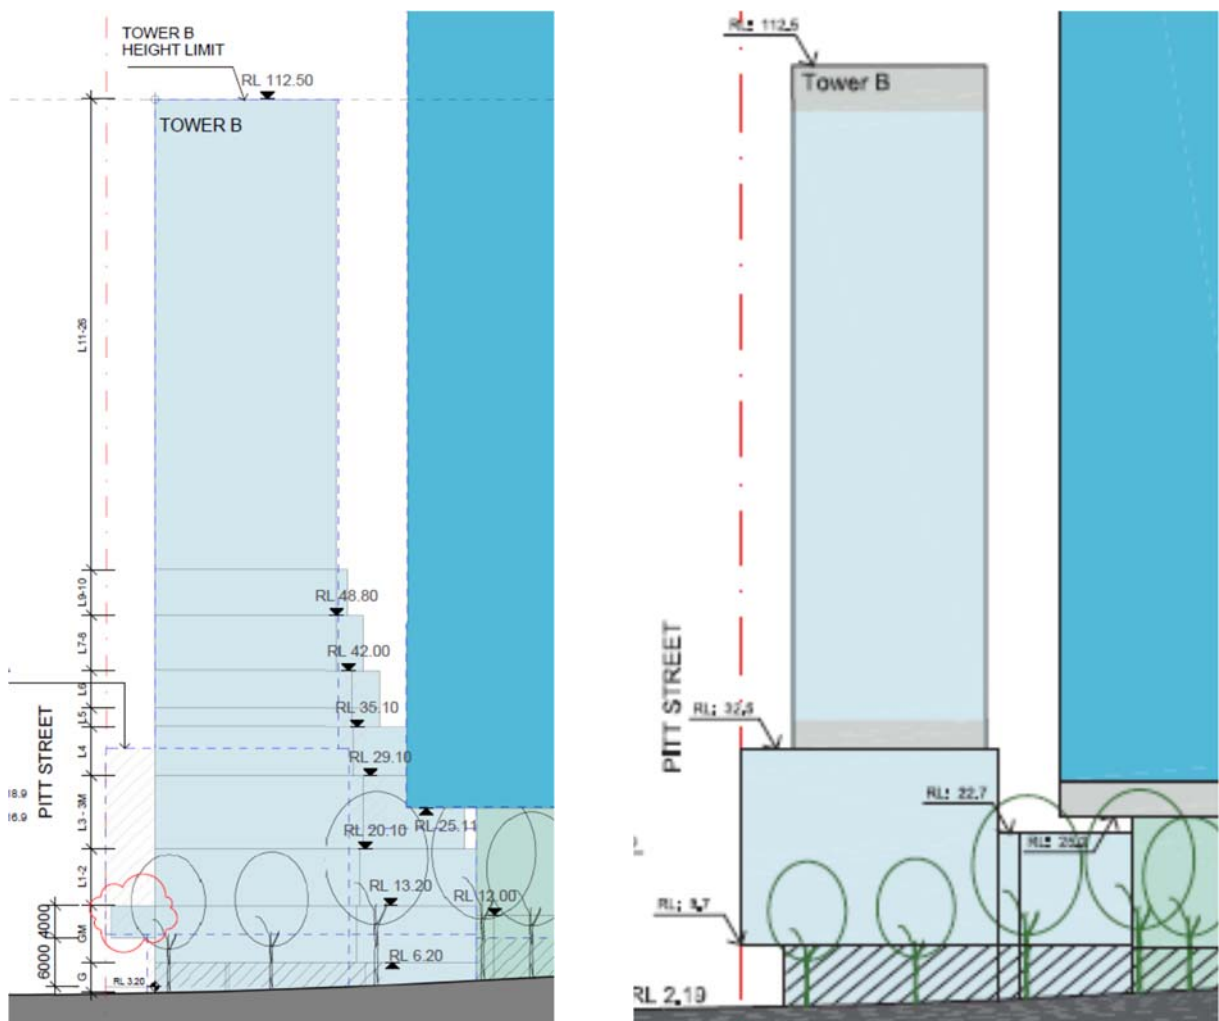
View proposed podium to Pitt Street (l) and approved podium to Pitt Street (r)
